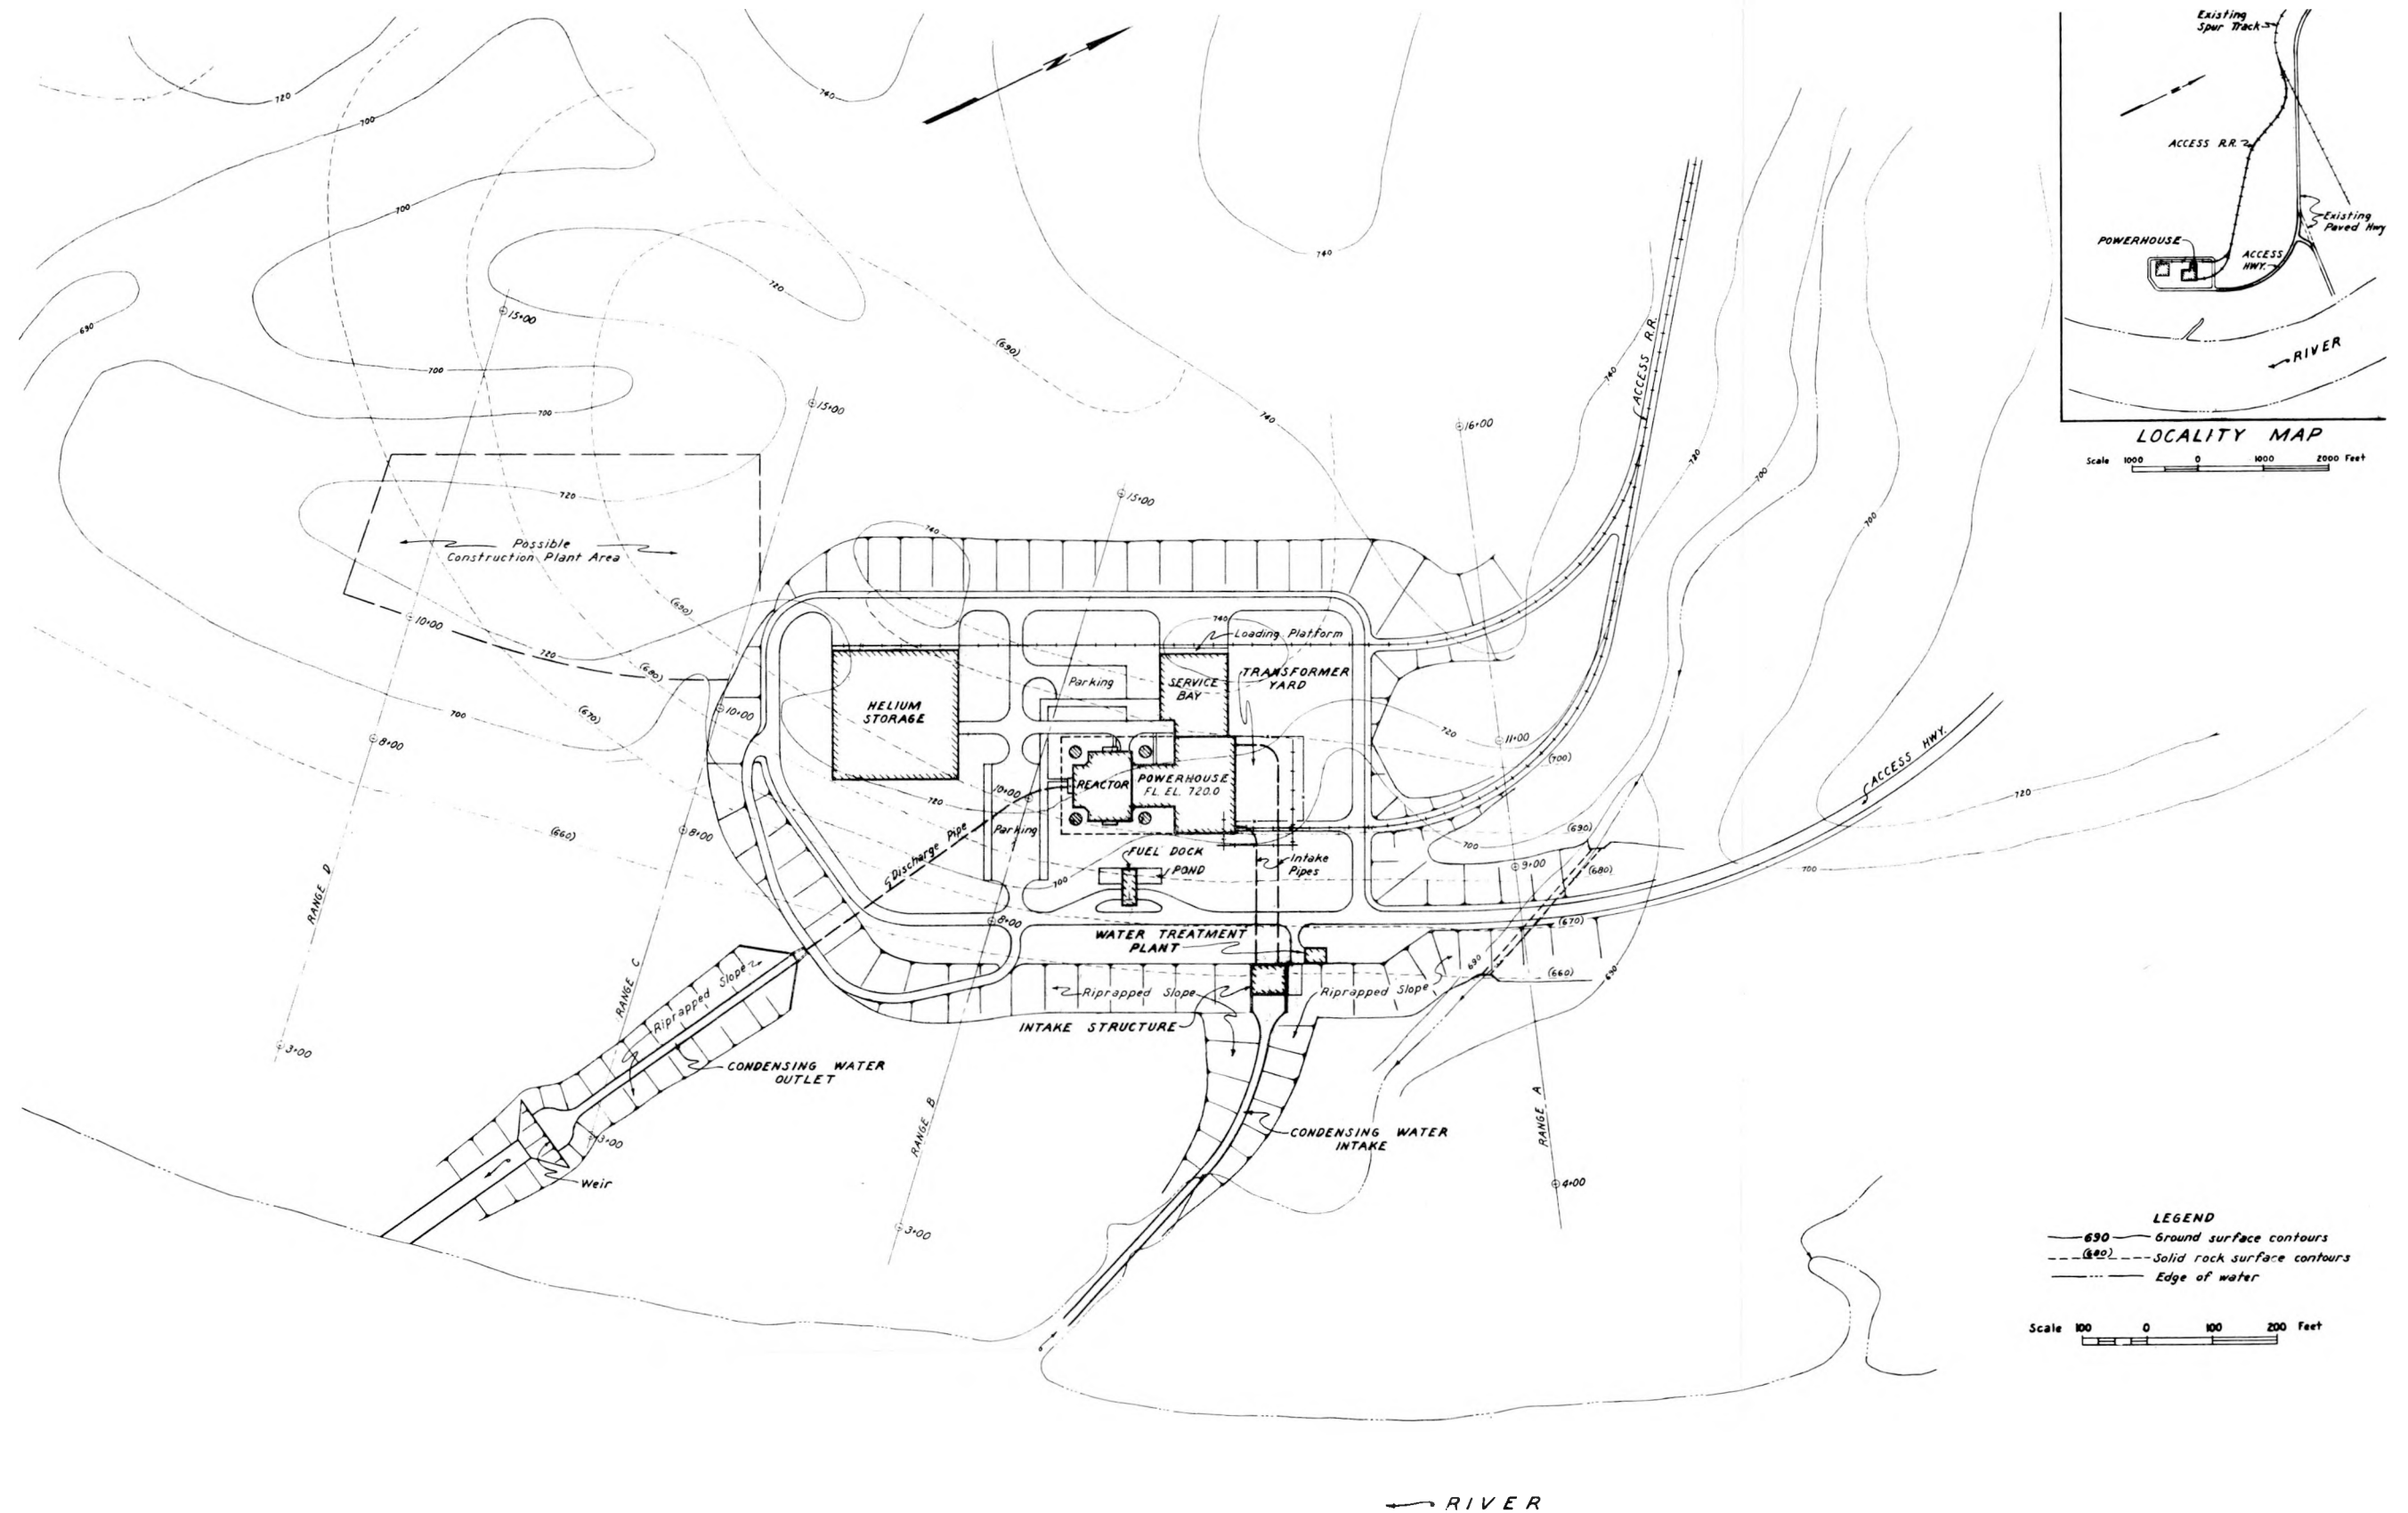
Site Plan — ORNL Gas-Cooled Reactor Plant (GCR-2) (Design Div., Tennessee Valley Authority).
